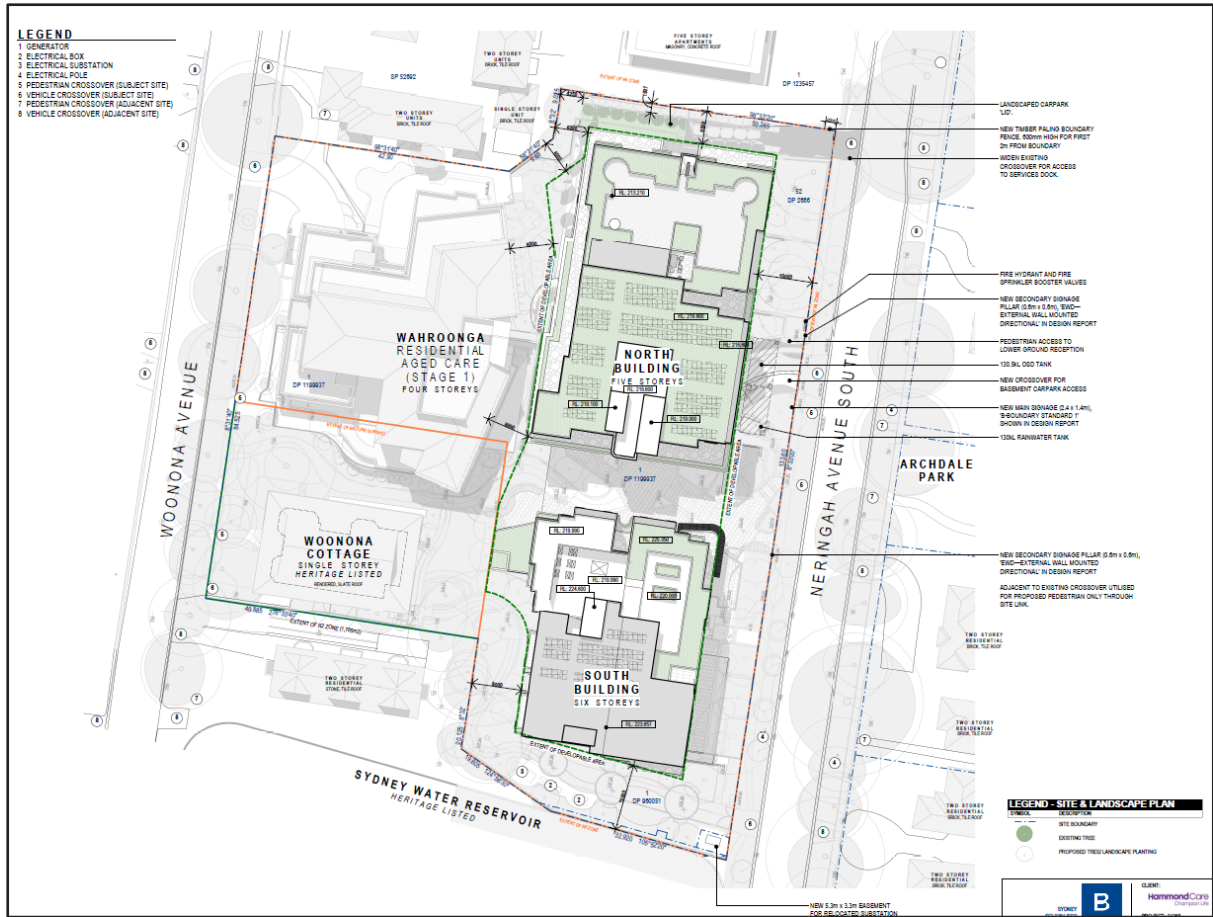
| Site Plan (Source: Applicant's Plans issued July 2023)
